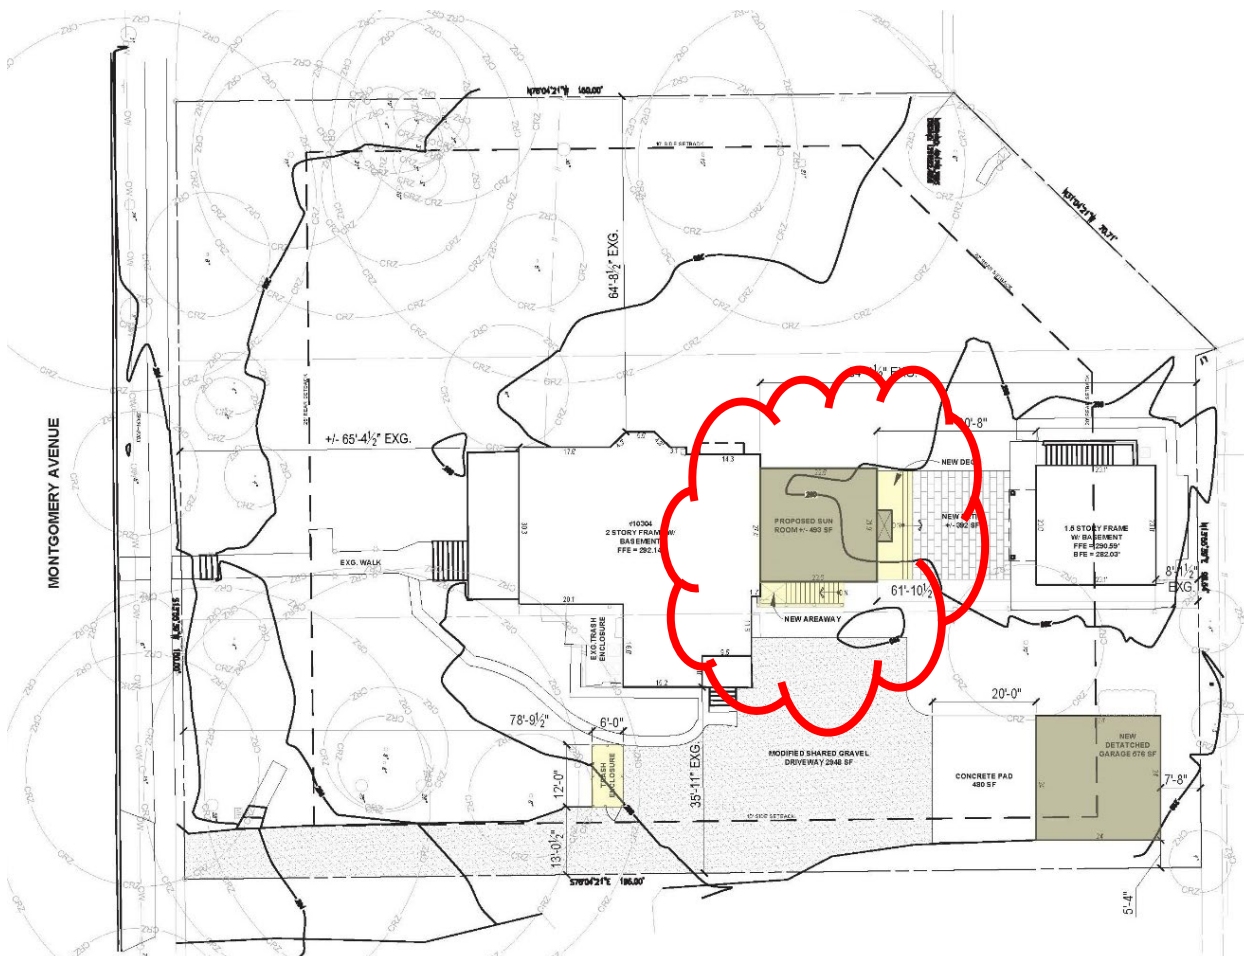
The proposed site plan shows the location of the proposed addition, arway, and deck clouded in red.
